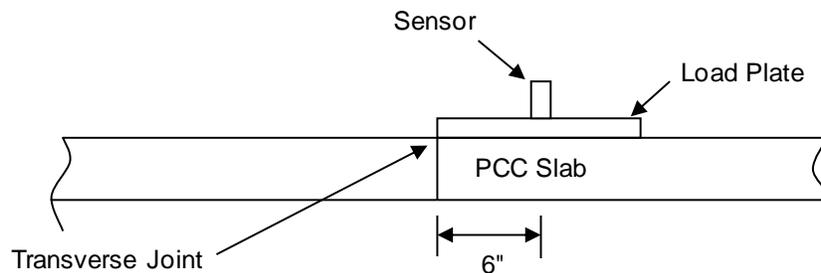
Joint Transfer Testing Sensor Spacing
